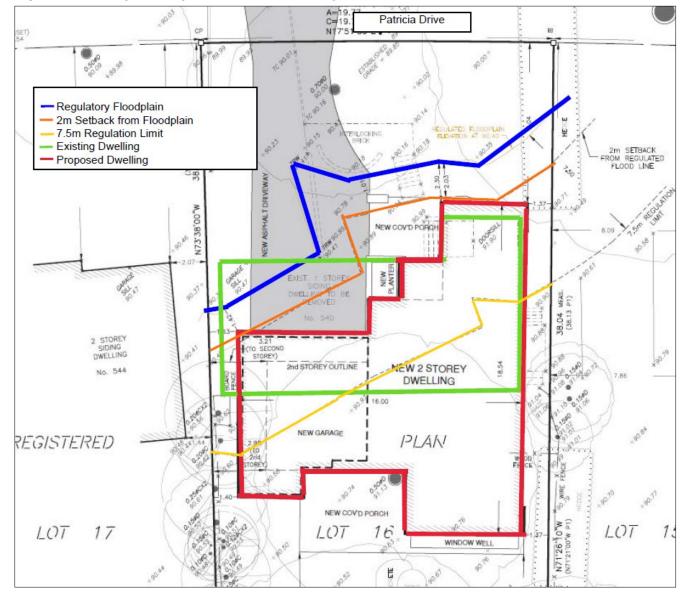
Existing dwelling and proposed dwelling within 7.5m of the floodplain
